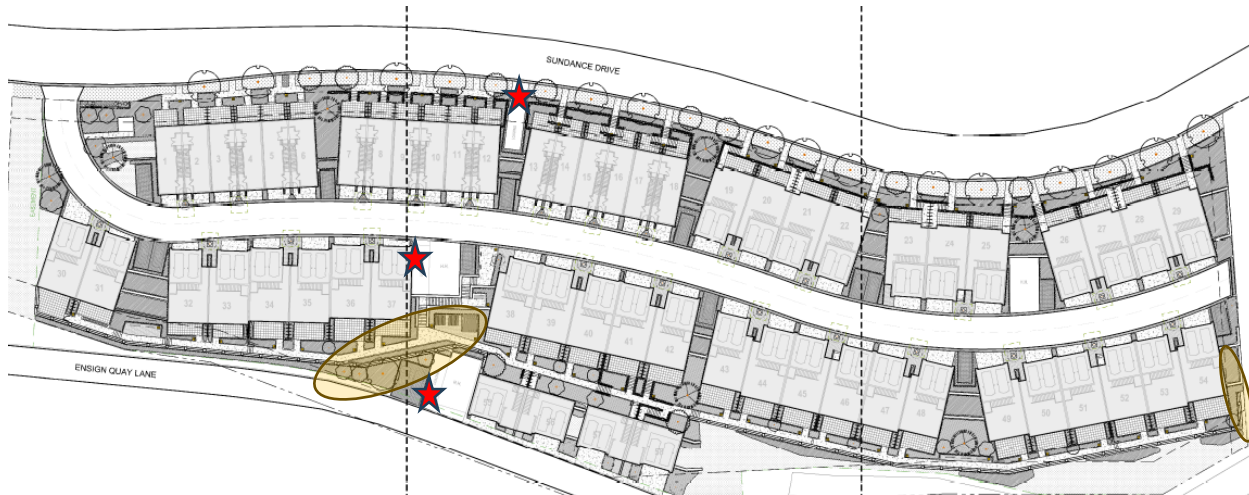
Landscape plan showing areas where retaining walls require max height of 4.5m (yellow hatch) and loading stall locations noted with a red star. The entire central access lane will require a variance from 7.0 to 6.0m.
